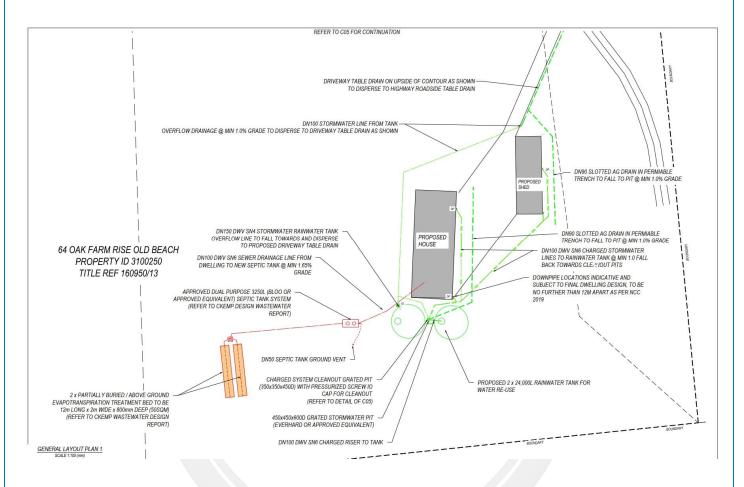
PROPOSED WASTEWATER SITE LAYOUT
